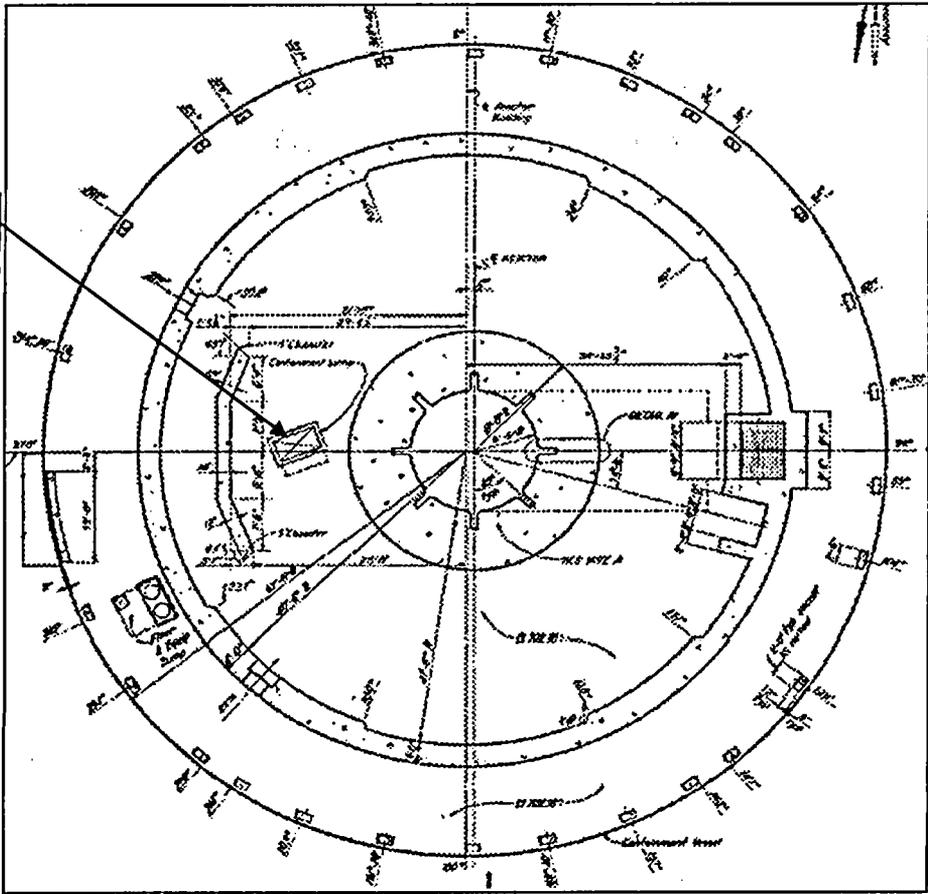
Watts Bar containment plan view, elevation 702.78'
